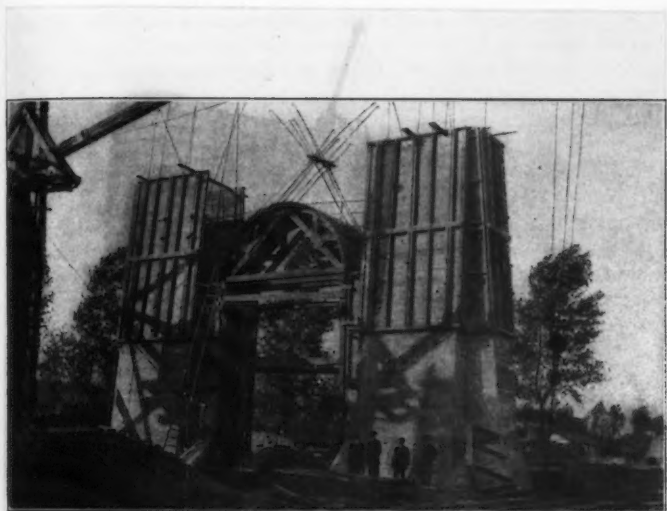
GENERAL ARRANGEMENT OF CONCRETE FORMS, RANDALLS ISLAND.
